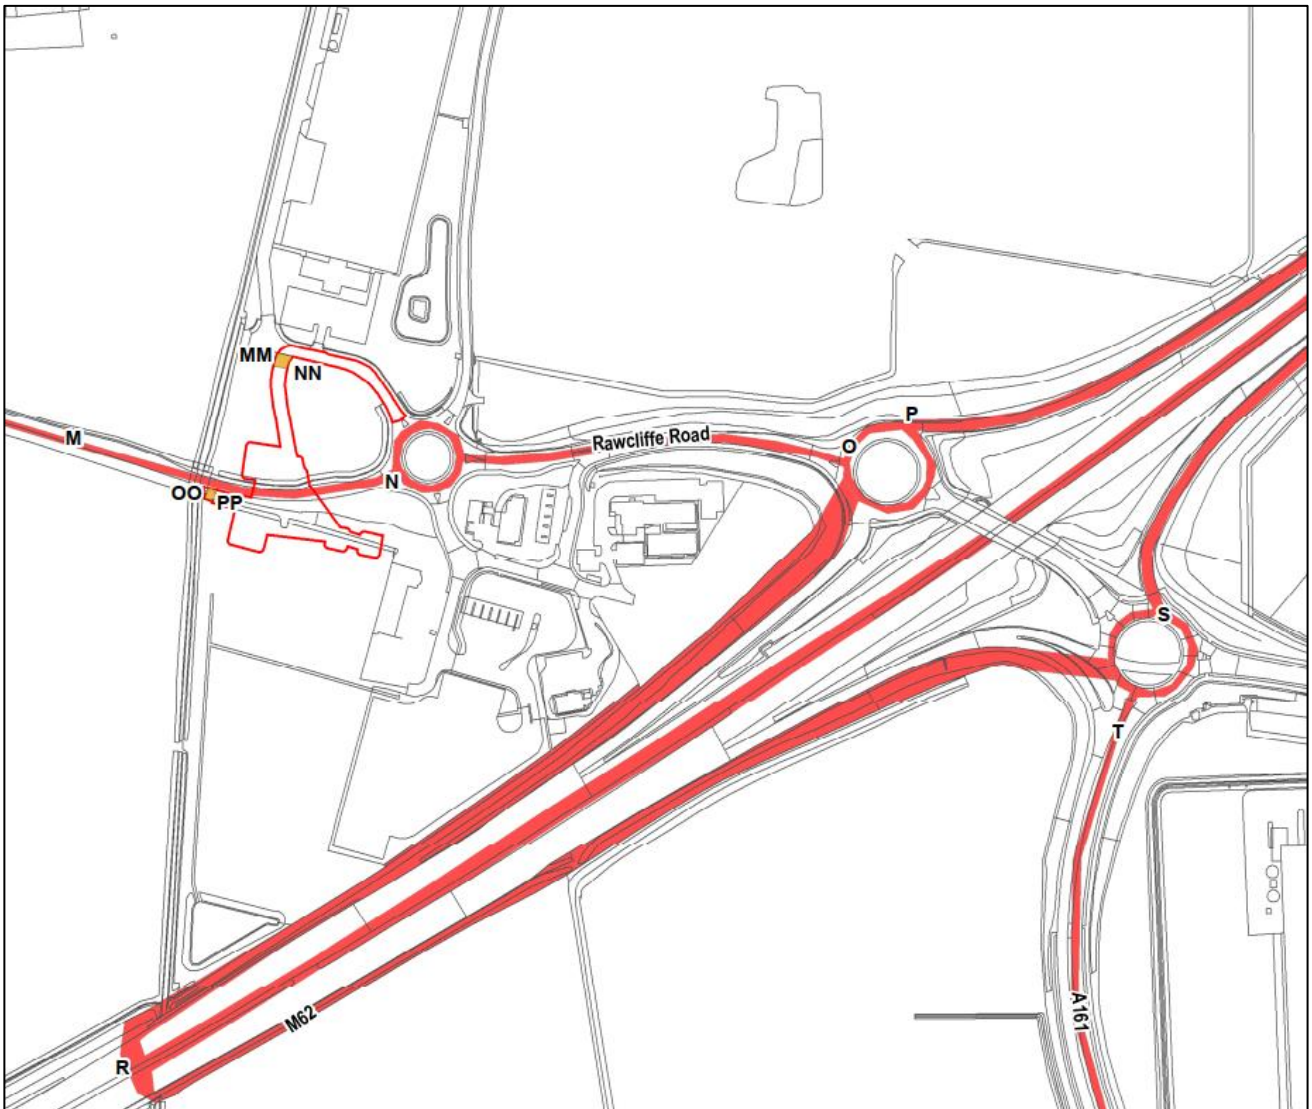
Extract from current ARoW Plan for OHL2 Works – Plan 2.4 – Rev P03, Sheet 05
